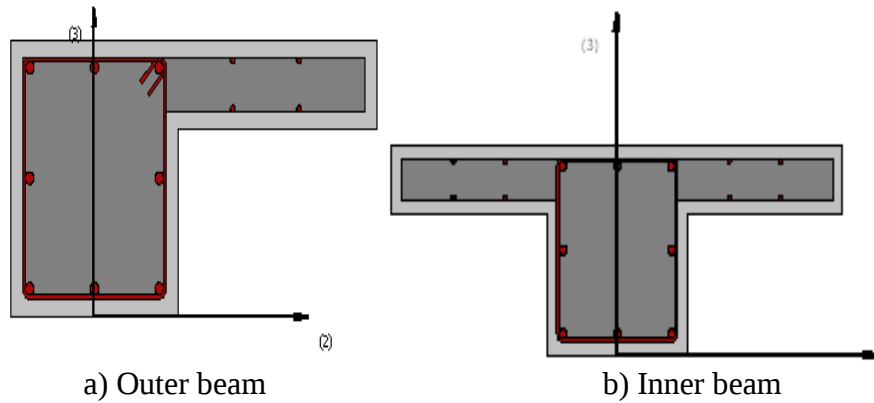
T-beam section 0.4x0.35 (8 No.18) for 4 story building: a) Outer beam and b) Inner beam.
